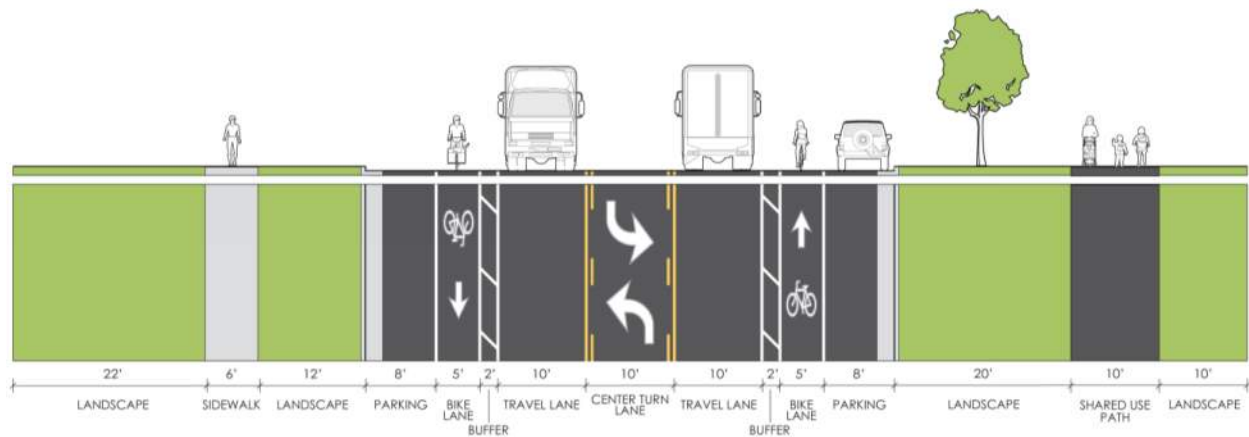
The recommended alternative for Segment 1 is Alternative 1B
